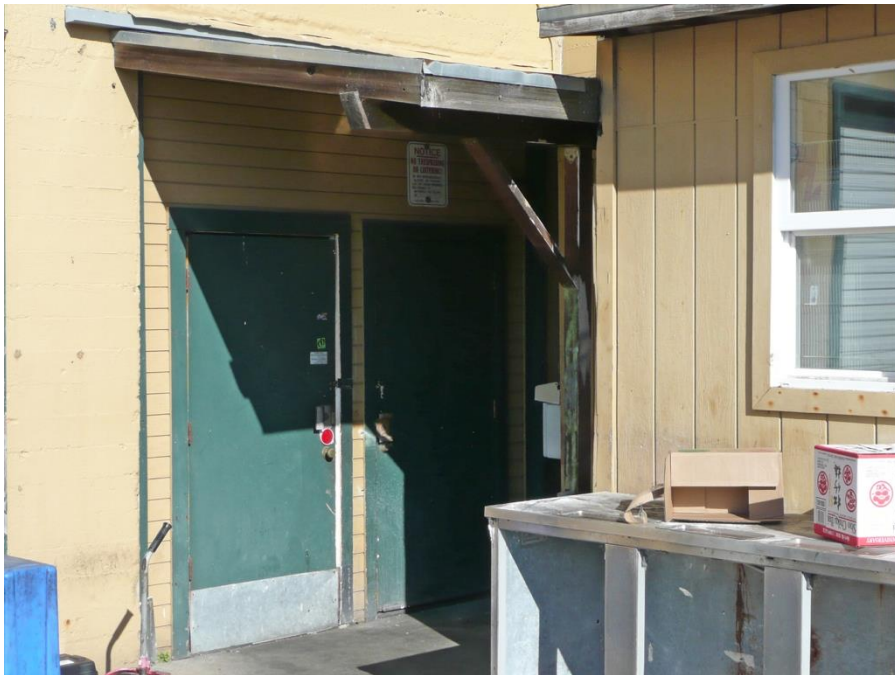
Detail of rear entry doors at the east elevation of the main building form, facing northwest. The contemporary shed-roof addition at the south elevation of the rear wing is also visible at right.
